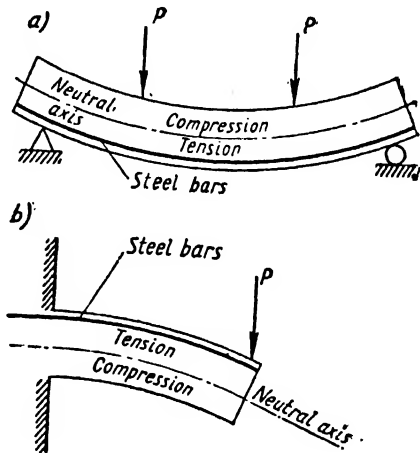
Sketch showing position of bars in reinforced concrete beams
